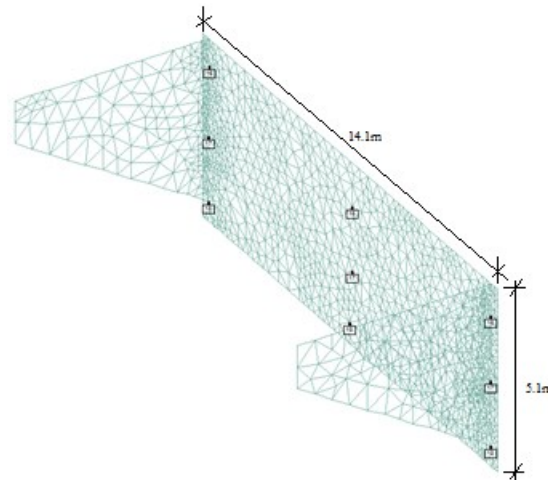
Positioning of North Abutment Backfill Springs (South Abutment Similar).
